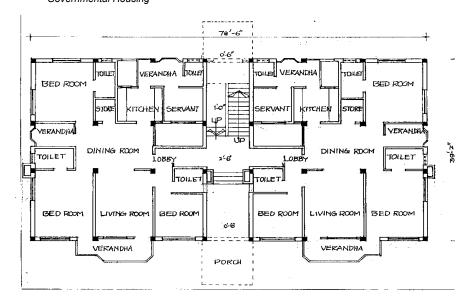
Ground Floor plan of 125o sq ft ('E' Type) in the New Building at Azimpur Governmental Housing Area
